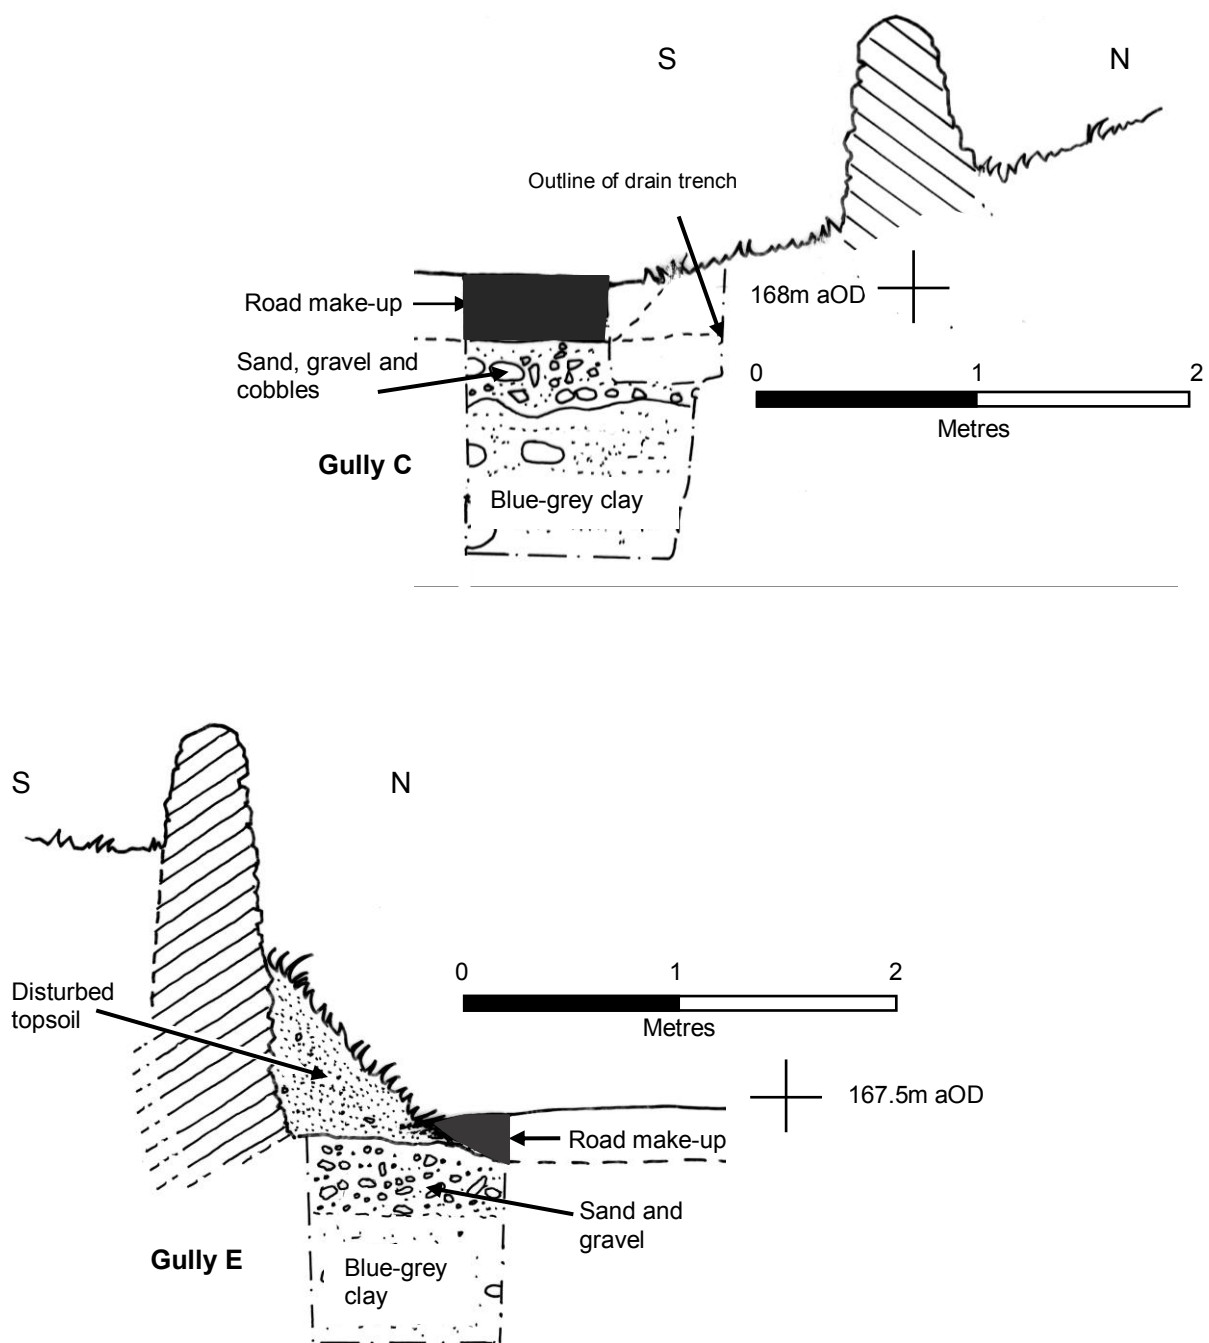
Sections of the excavations for Gully Pots C (top) and E (bottom).
